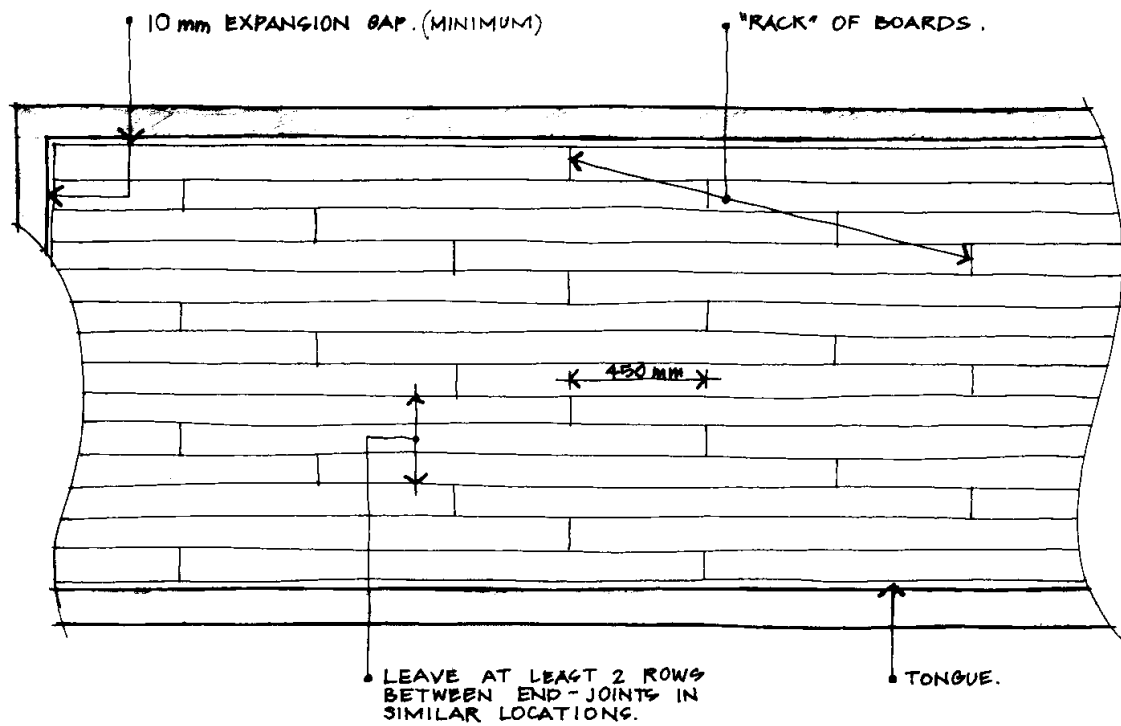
Diagram Showing Board Layout And End Match Board Locations. Board Racking Typical
